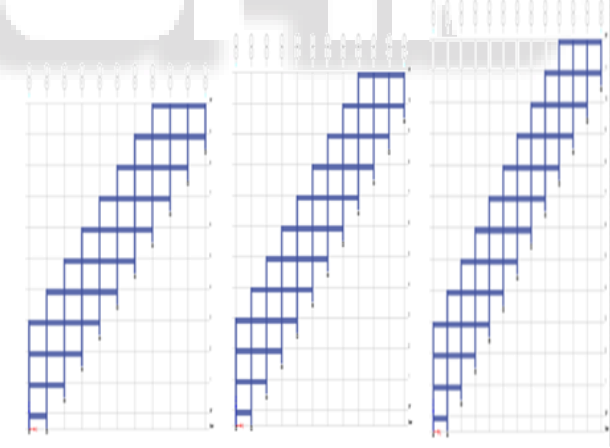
Building is of G+9, G+10, G+11 storeys, constructed in step & set back building frames configurations
